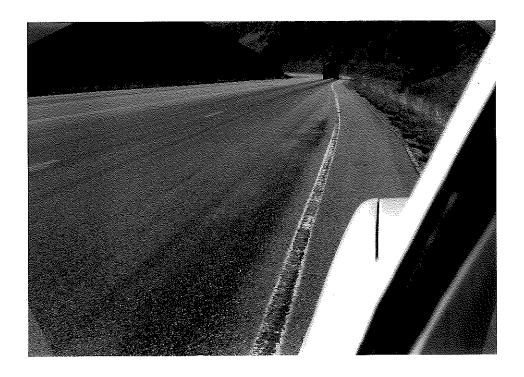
Raveling and Surface Pitting in the Southbound Truck Lane of Survey Section No. 2.
